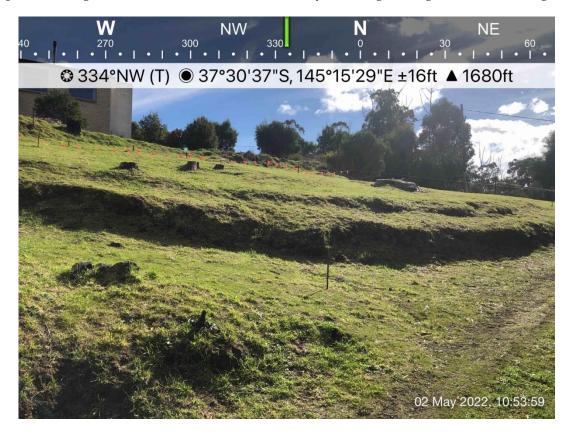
Looking north-west towards location of proposed new dwelling within proposed new cut-out area.
